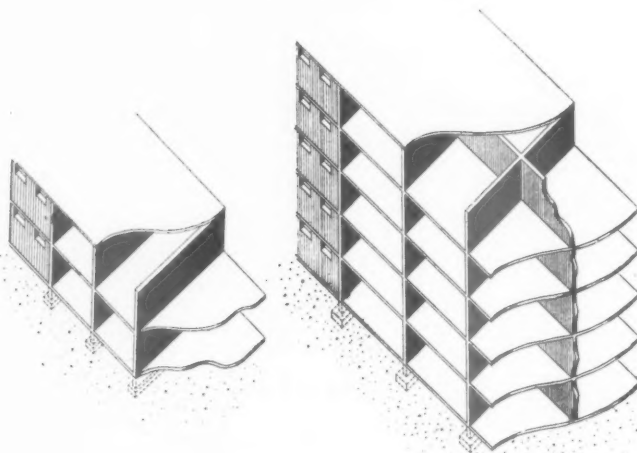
Constructional principle of Mr. Arup's safe housing. Concrete crosswalls and floors form a bomb-resisting box construction. The outside walls are of reinforced brick. There may be 2 to 5 storeys.
